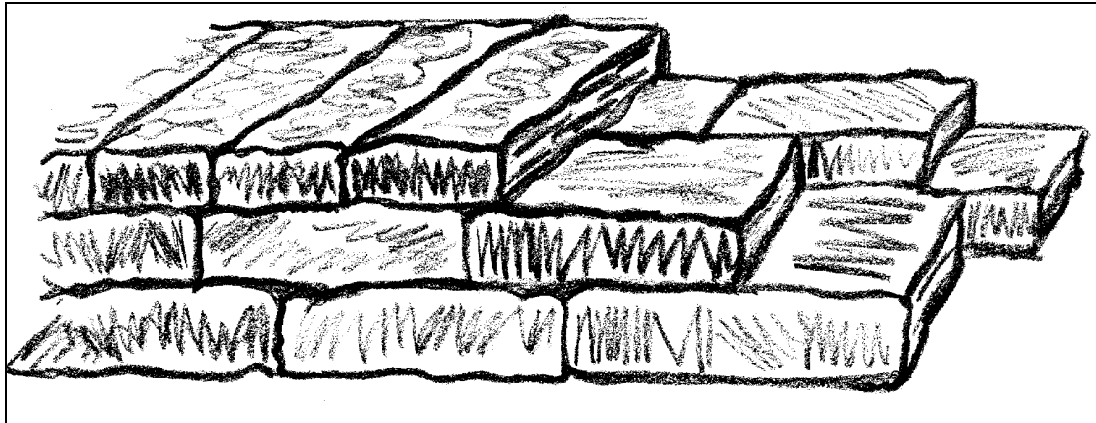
Wall construction: blocks laid two wythes deep with alternating headers and stretchers
